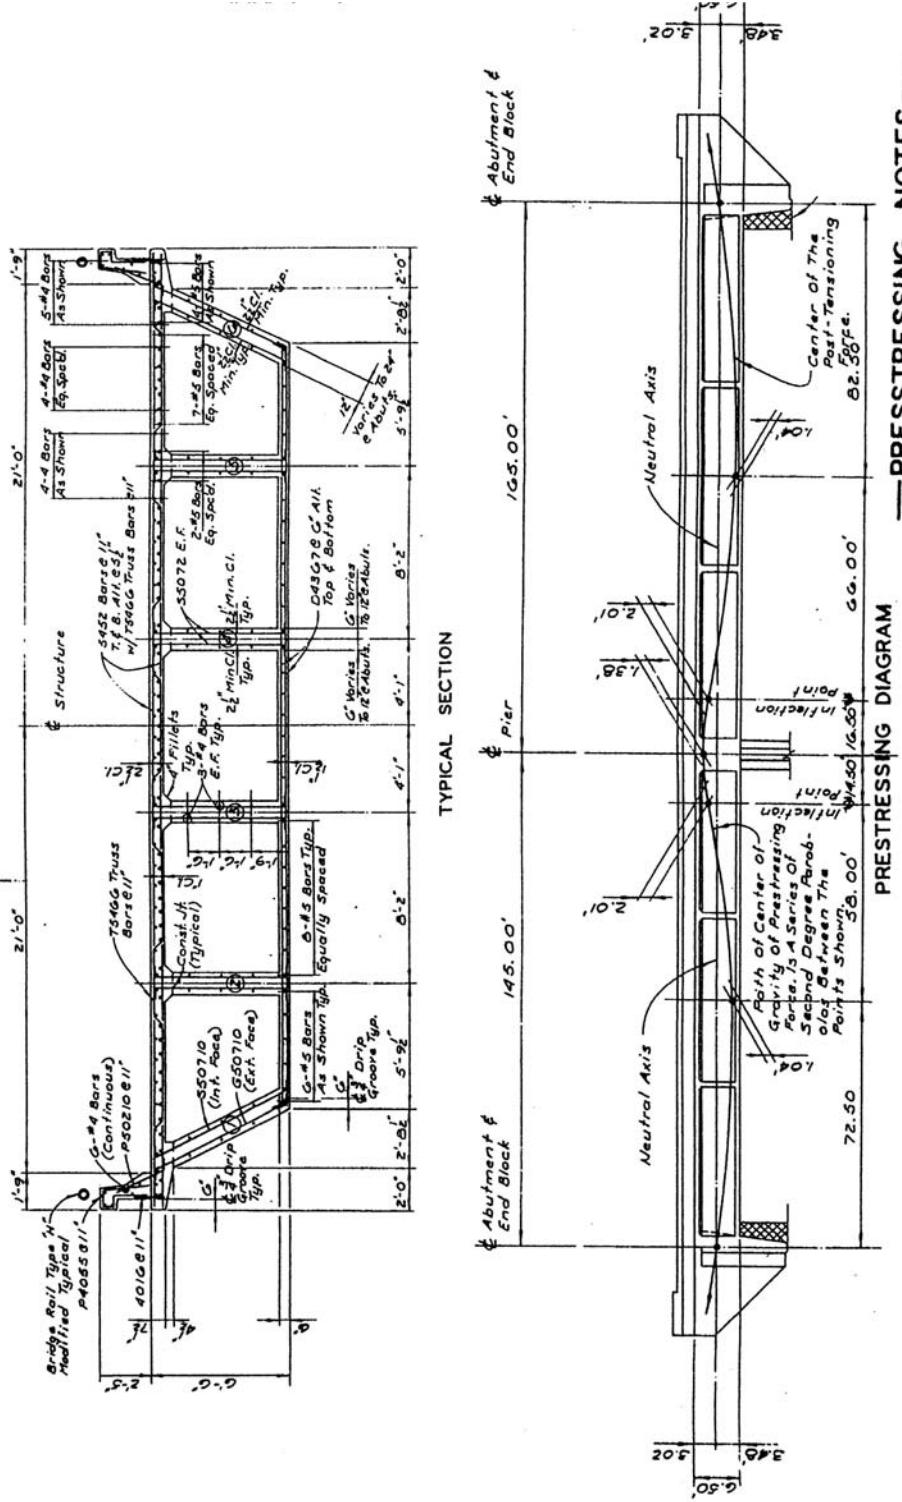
Bridge I871E Typical Section and Prestressing Diagram
